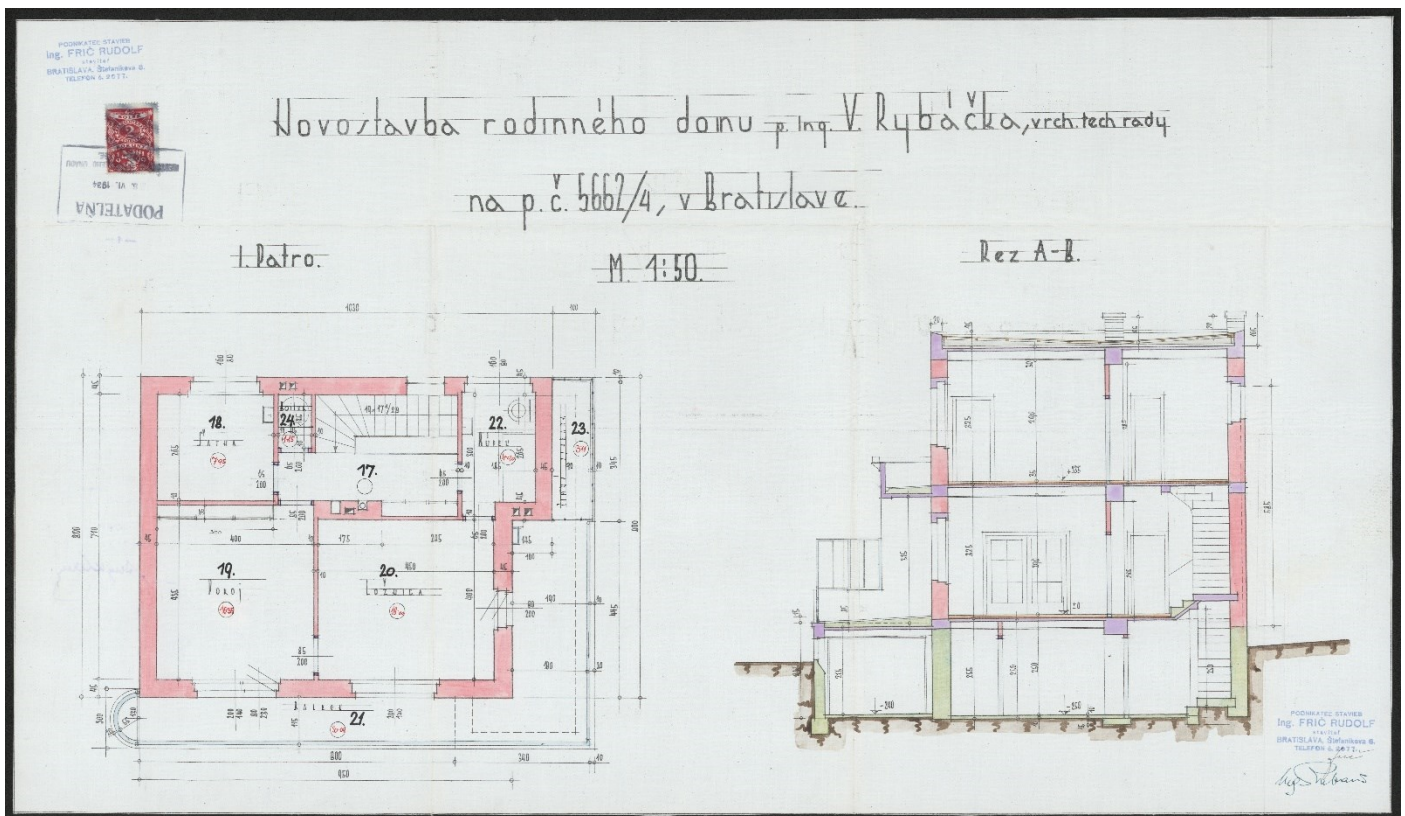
Rudolf Frič, House of the civil engineer Rybáček, Kubániho Street, Bratislava, 1933 – 1934. First floor and cross section. (Source: Bratislava City Archives, 1934)
